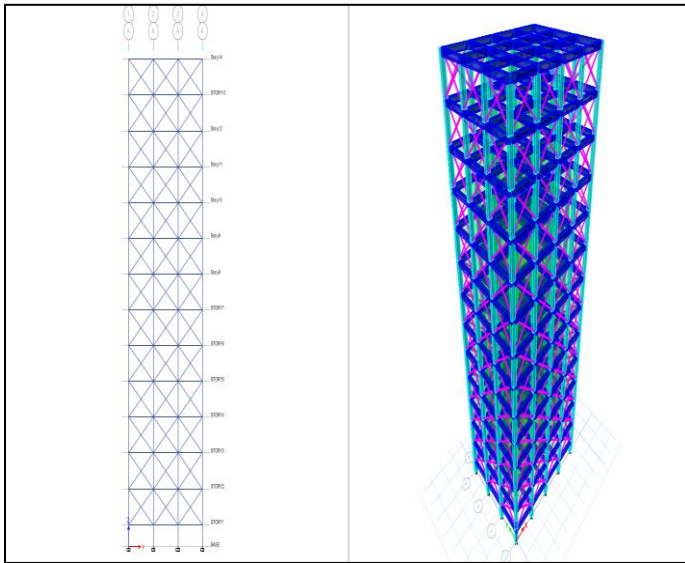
Elevation and 3D view of RC frame structure with X type bracing
